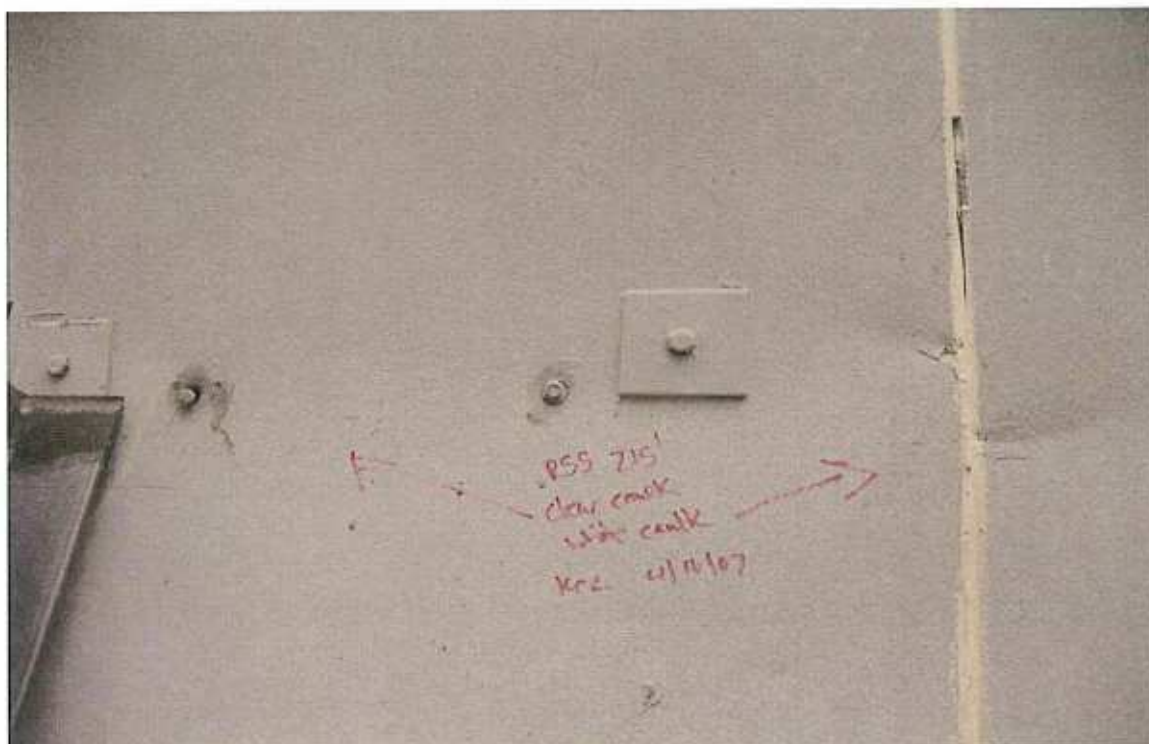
Caulk on Bolts and Joints on RSS Level 215
